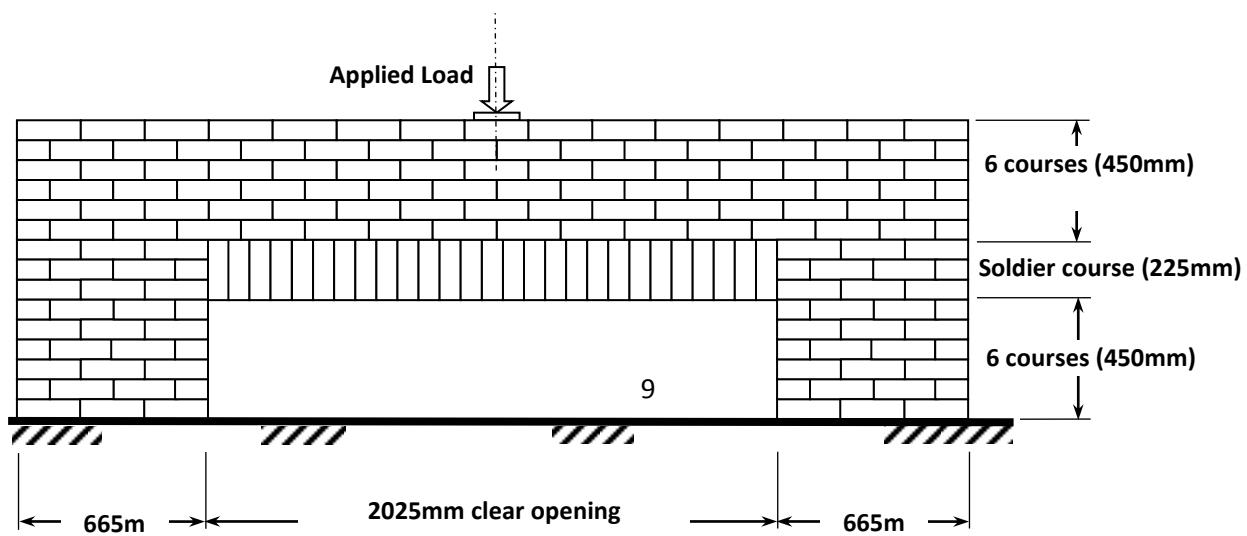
Typical details of masonry wall panel tested in the laboratory.
